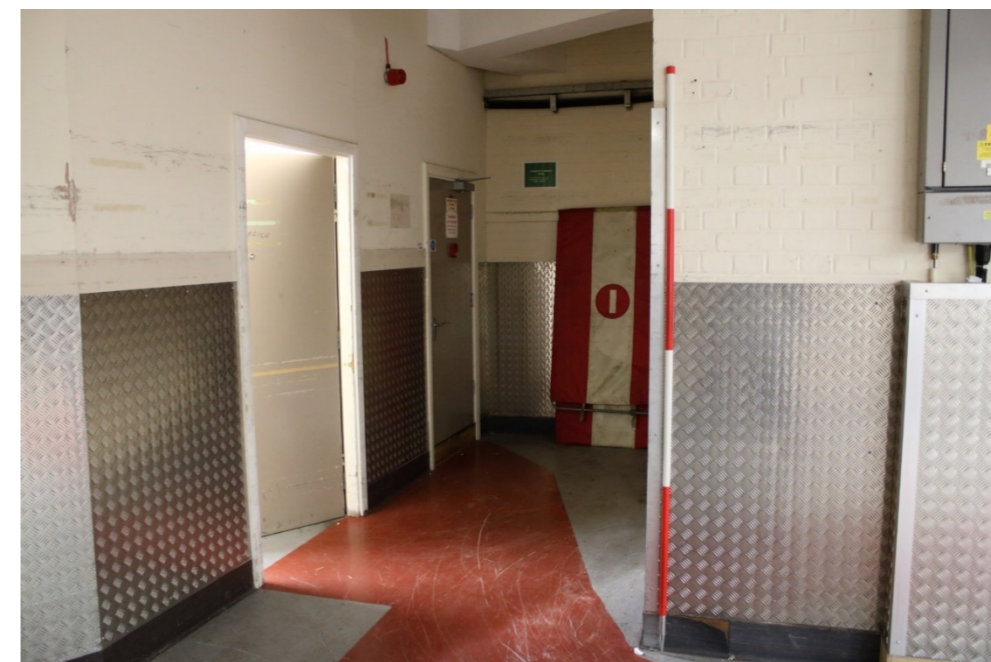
View northeast along corridor to office and further plant room to rear of first floor retail area
